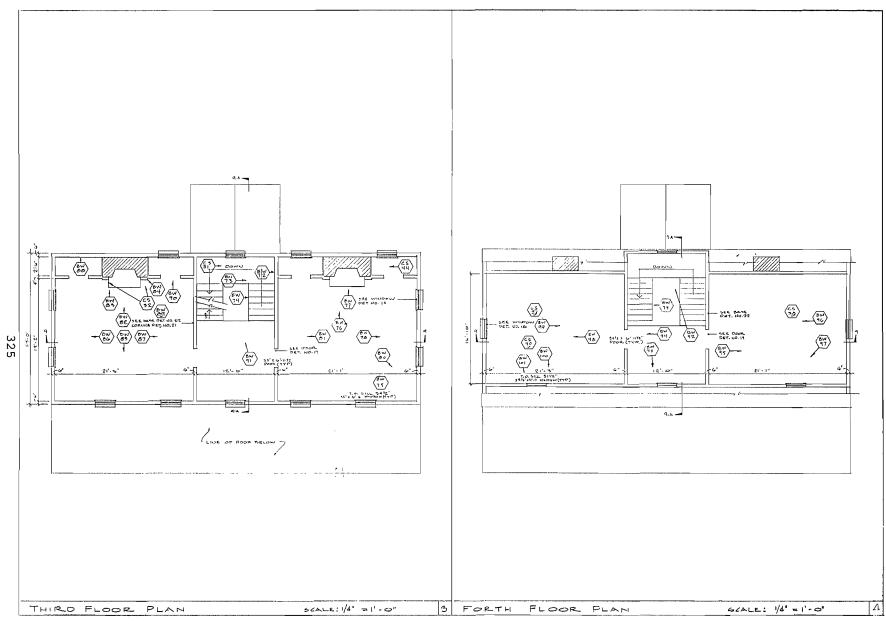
Third and fourth floor plans of the Vanderhorst Mansion, adopted from those developed by Robert Shoolbred Engineers.
